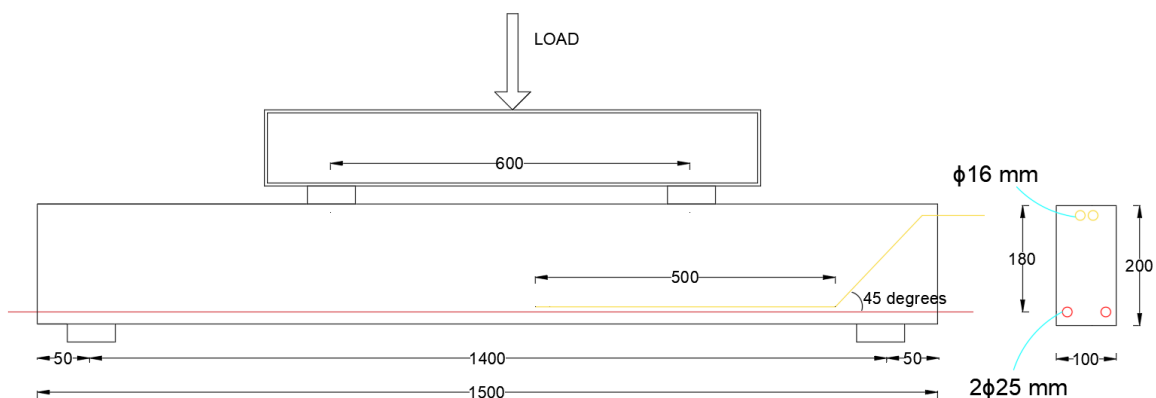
Geometry of test specimens- All dimensions are in millimeters
